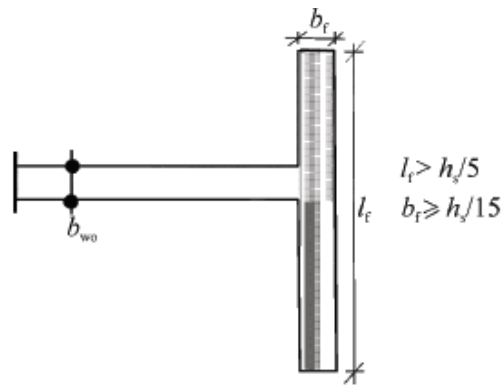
Confined boundary element not needed at wall end with a large transverse flange
